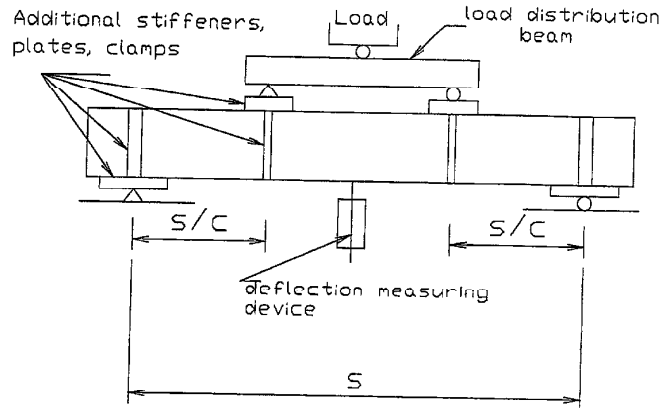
Simply-Supported Pallet Beam Tests.
